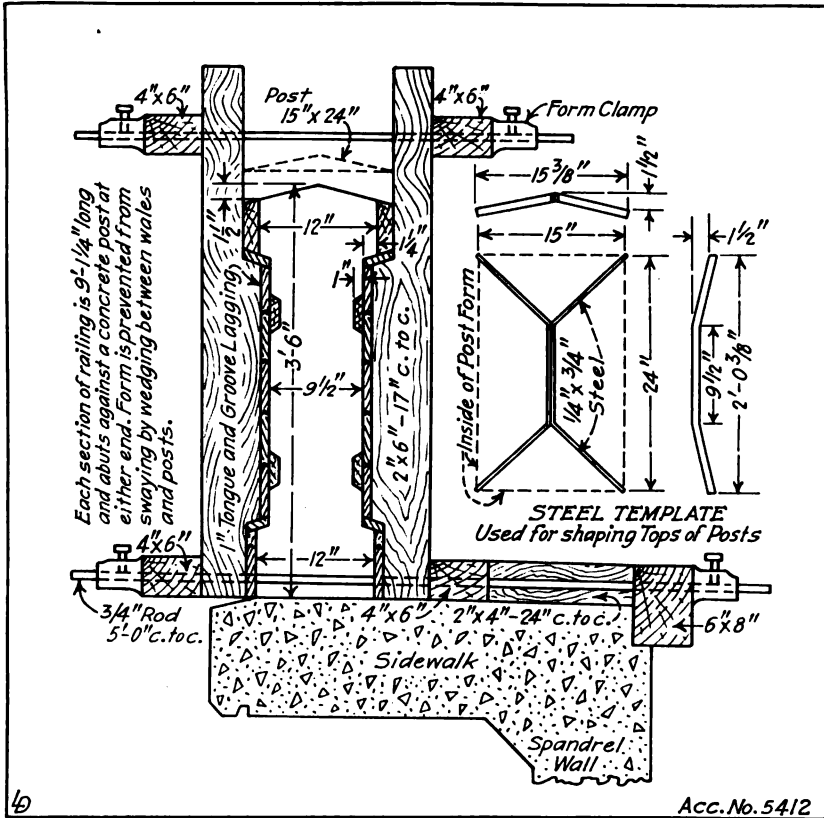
DETAILS OF FORMS FOR PANELS AND POSTS OF RAILING ON BLACK STREET BRIDGE
